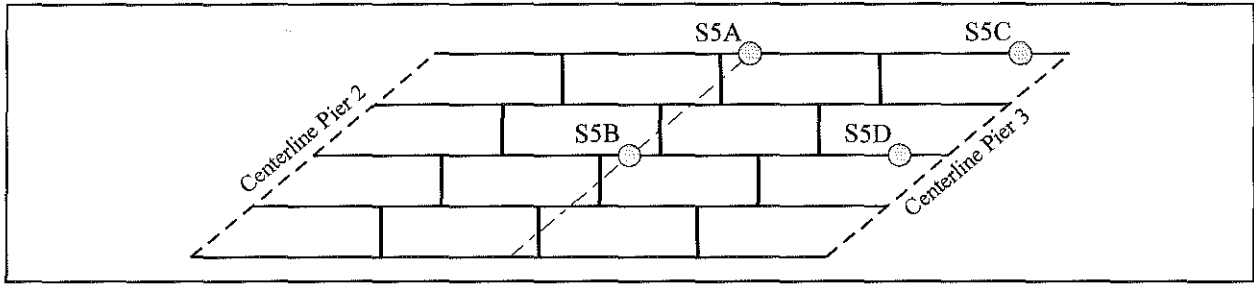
Girder Strain Gage Locations in the Southbound Bridge (Bridge With Intermediate Diaphragms).
